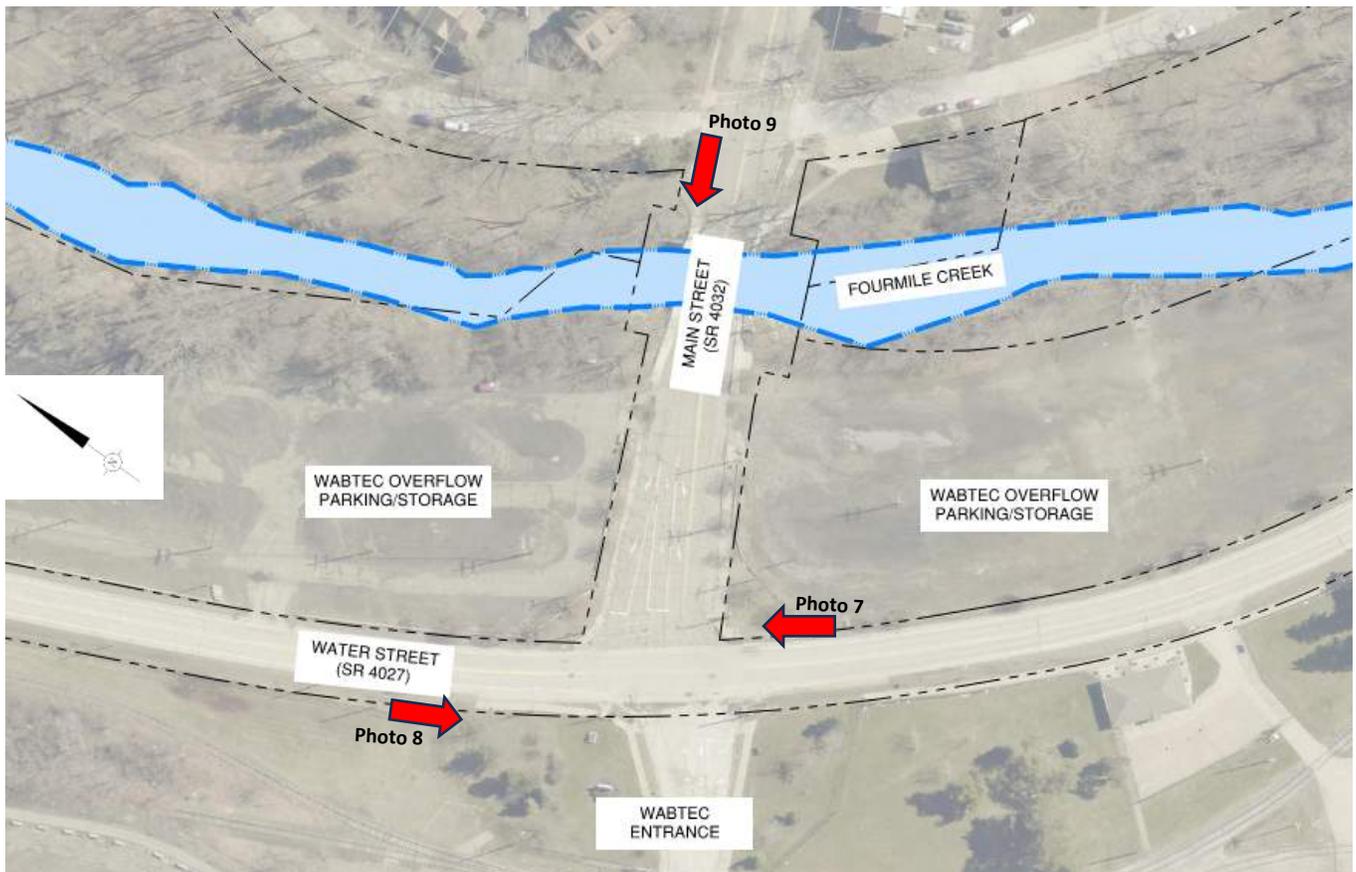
Existing conditions near Water Street and Main Street (not to scale).
